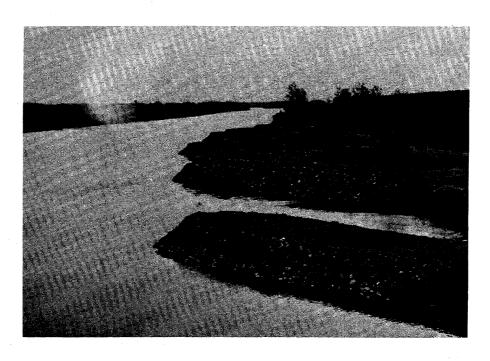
Revetted earth embankment spurs, inclined upstream. (North Saskatchewan River, Site 258; photographs from Saskatchewan Dept. of Highways and Transportation.)
